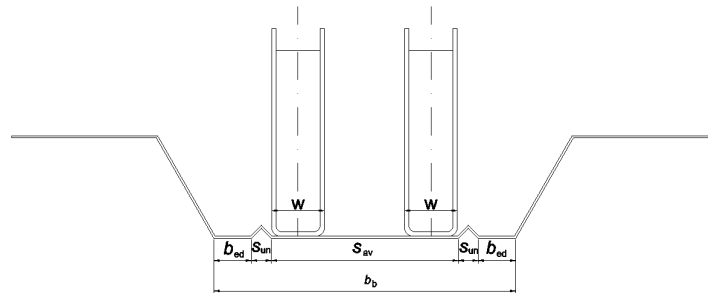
Sheeting with two rib stiffeners and connectors parallel with the beam (multiple rows).
